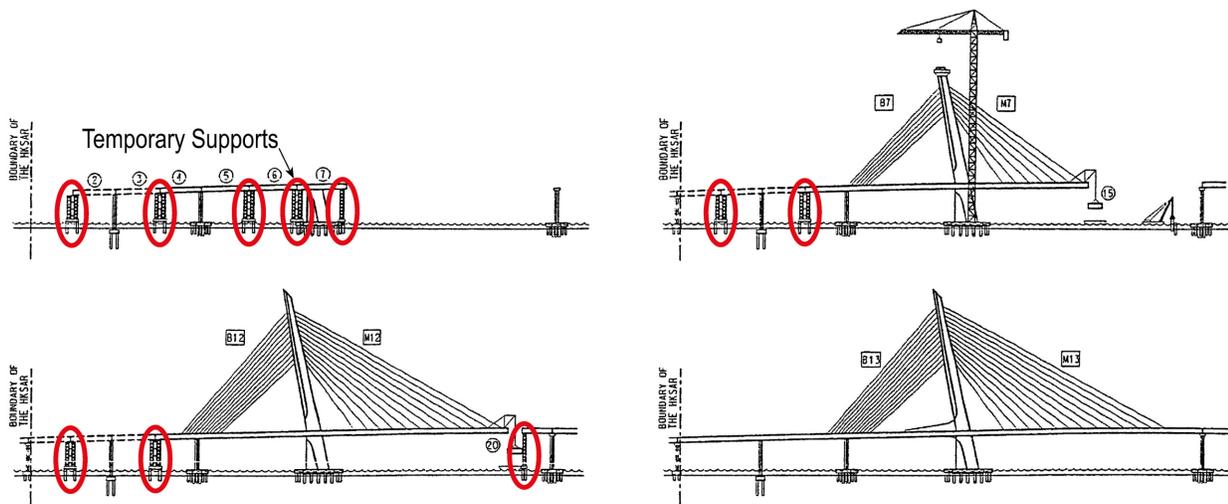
Erection of back span in half-length units, simply supported on permanent piers and temporary towers. After they are connected and made continuous, the temporary support towers are removed; Erection of typical segments concurrently with the tower; Erection of last bridge segment (closure); Bridge completion.
